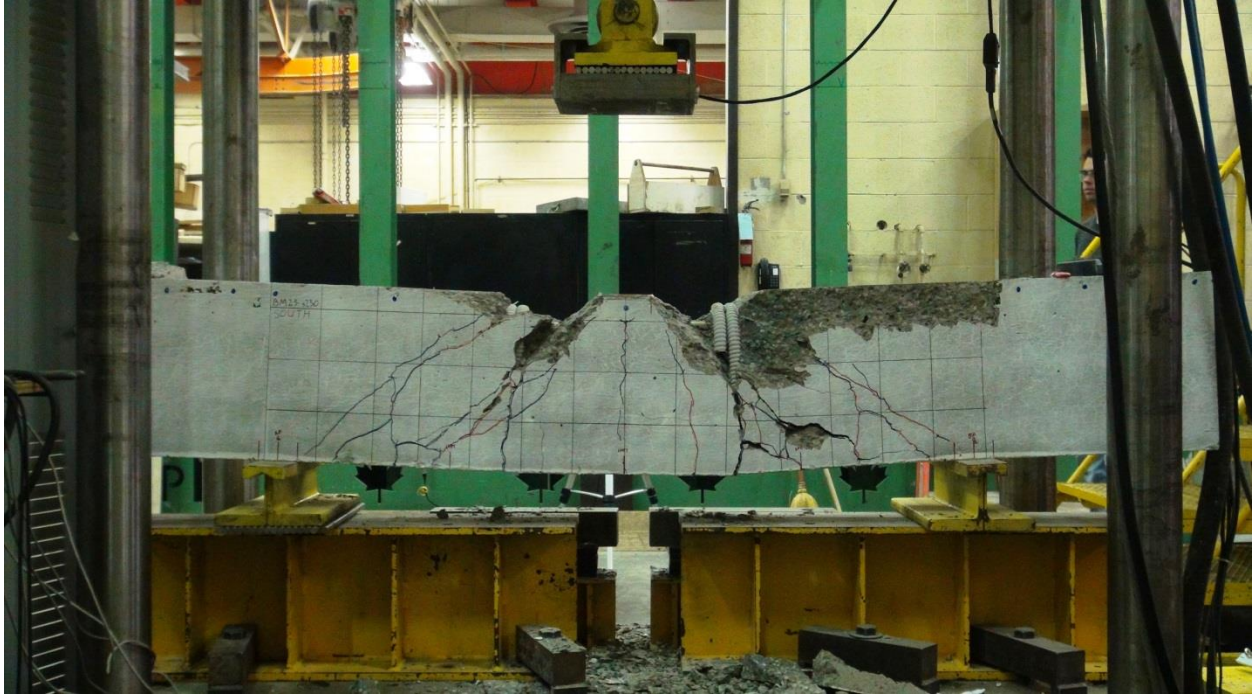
BM25-s230 Alternative Photo of Entire Beam Under Load After Testing
